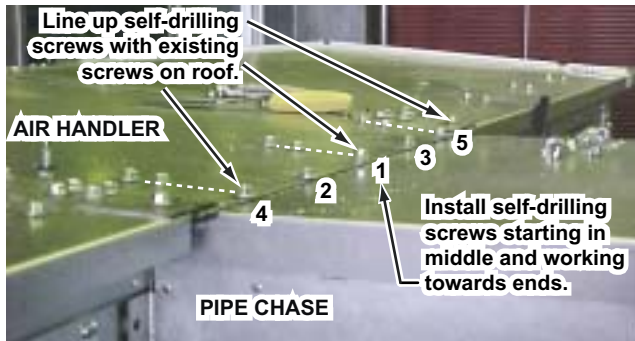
PIPE CHASE TO ROOF INSTALLATION
